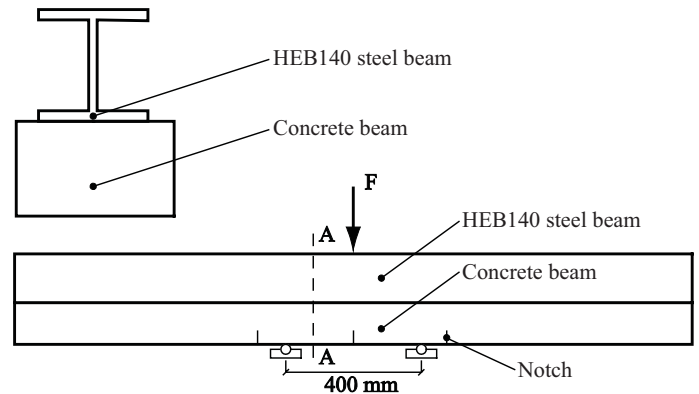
Test set-up used to pre-crack the beams. Three cracks were opened on each beam.
